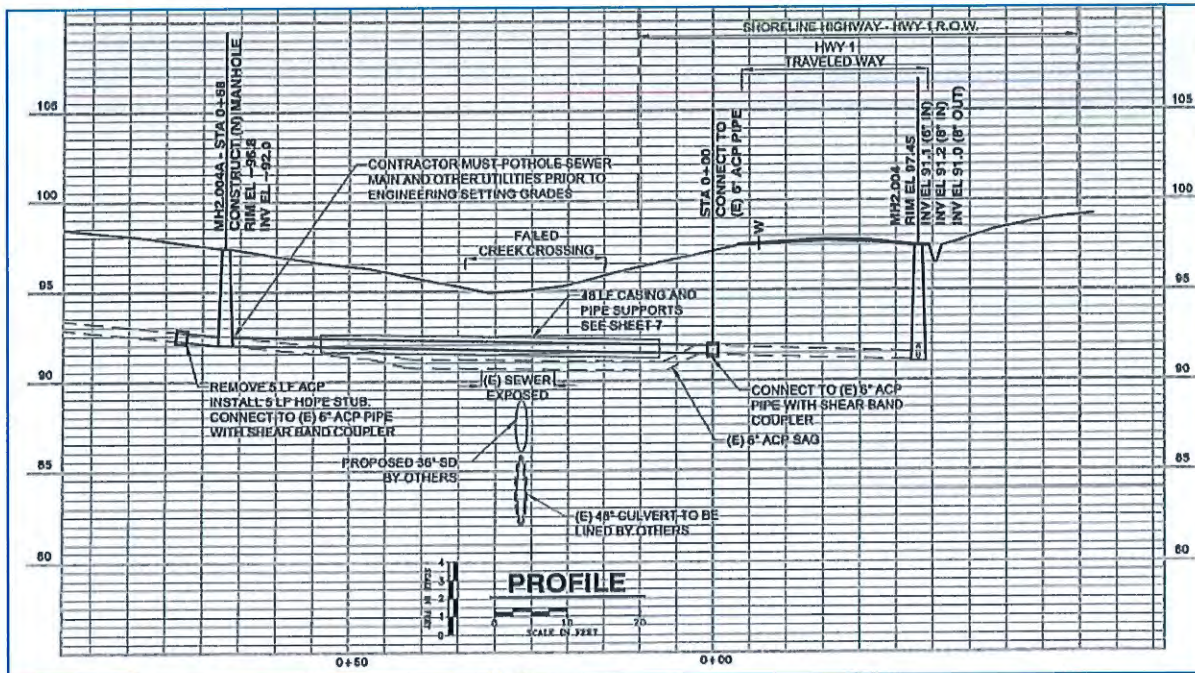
August 2015 Profile for TCSD Sewer Replacement with steel casing and drilled pier to repair sag in sewer main, and support new sewer. Note additional culvert repairs proposed by resident's consultants. Work was to include CIPP repair of existing culvert, installation of one or two new culvert pipes above as a bypass for the existing culvert.
